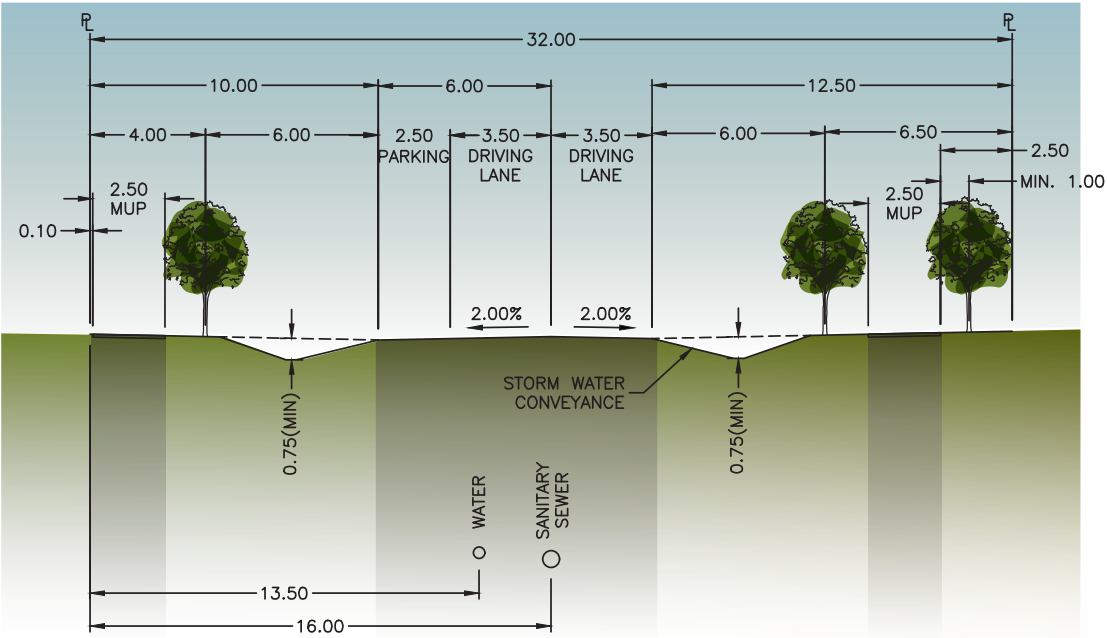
Grand Boulevard -Undivided (Parking on one side)
